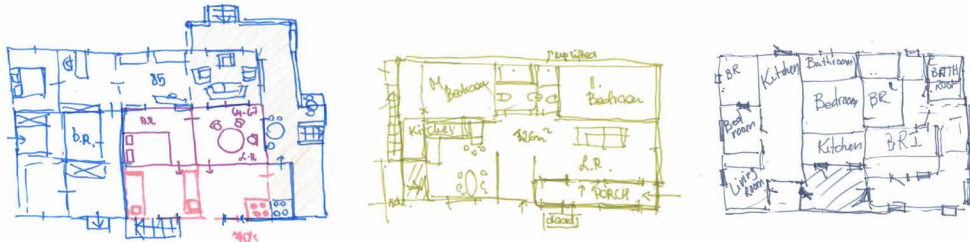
Examples of drawings of the housing layouts and modifications.
